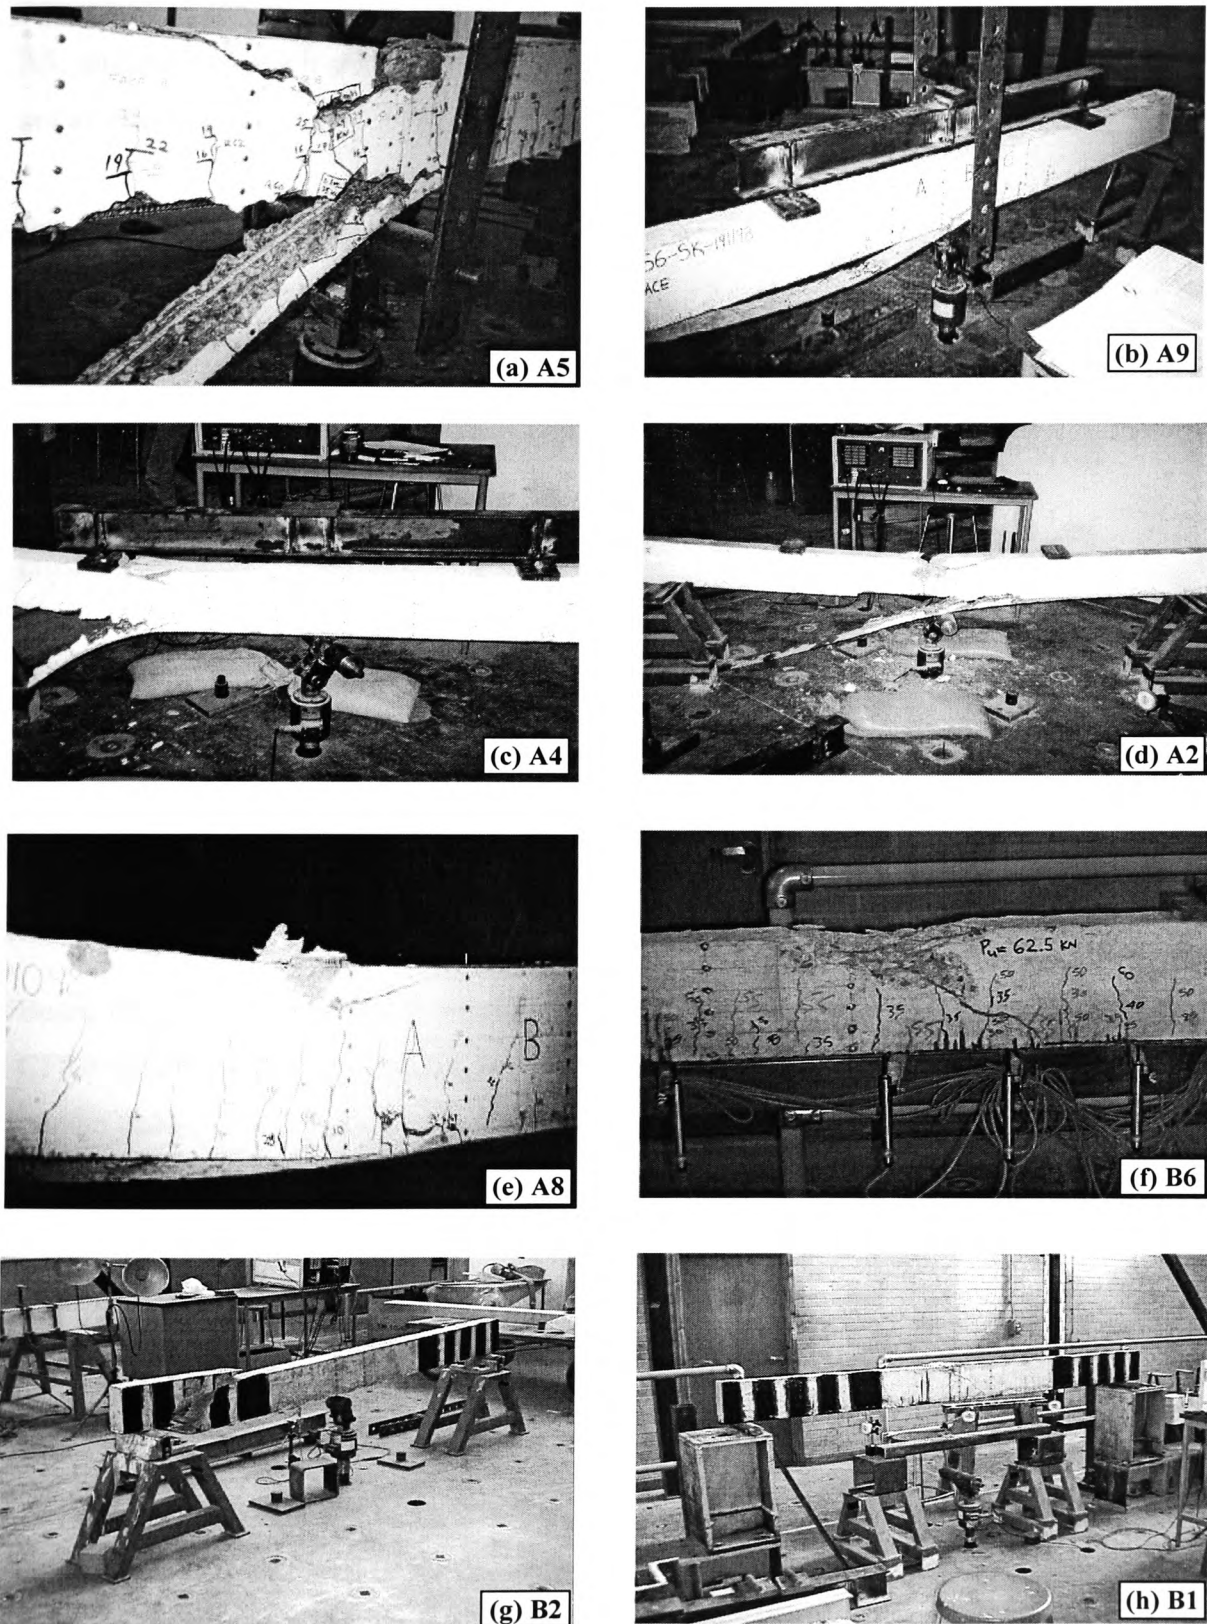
Typical Failure Modes of Series A and Series B Beams
